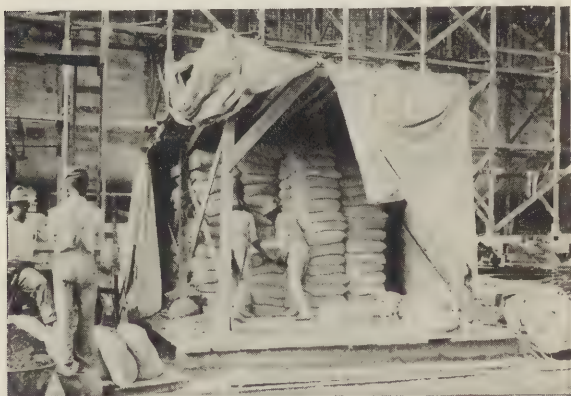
Shelter for cement at mixer. Capacity about 250 bags. Roof of slats and tar paper; canvas sides. Note floor raised off ground on mud-sills.
